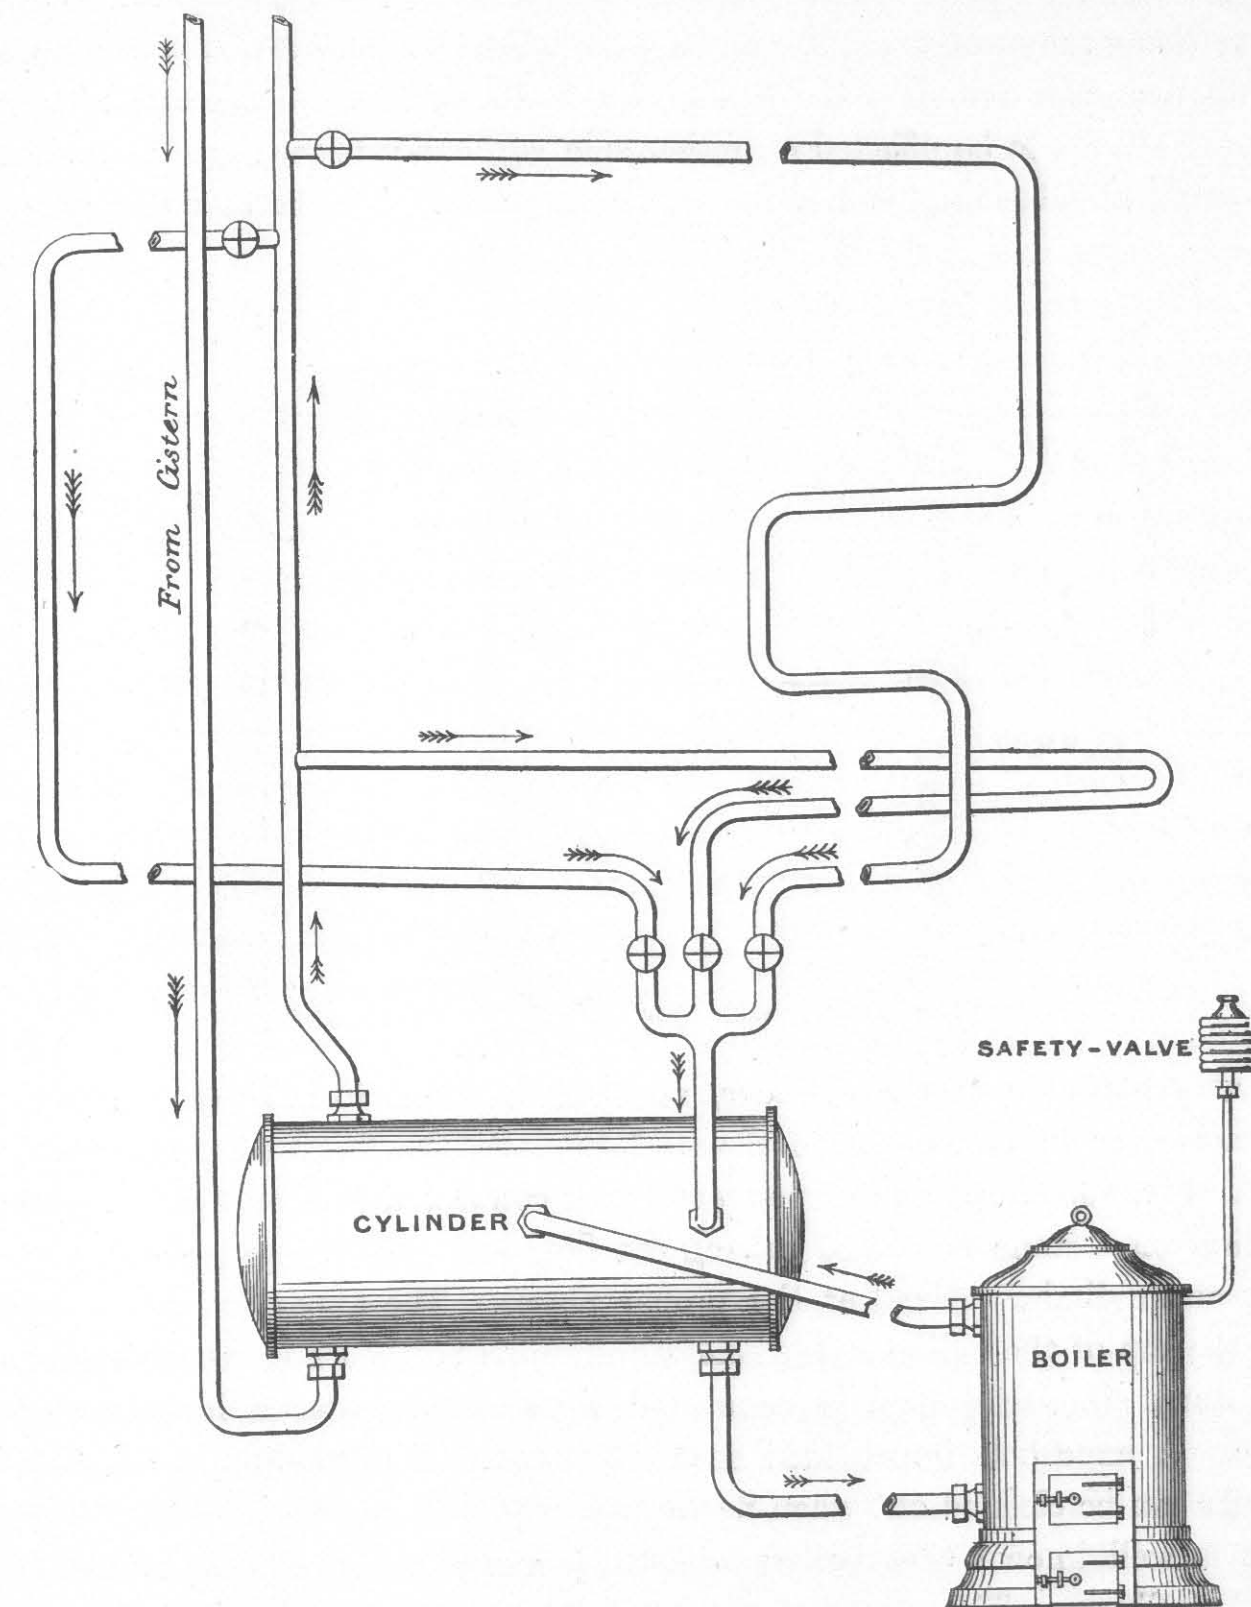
Hot-water Apparatus, with Independent Boiler and Horizontal Cylinder.
